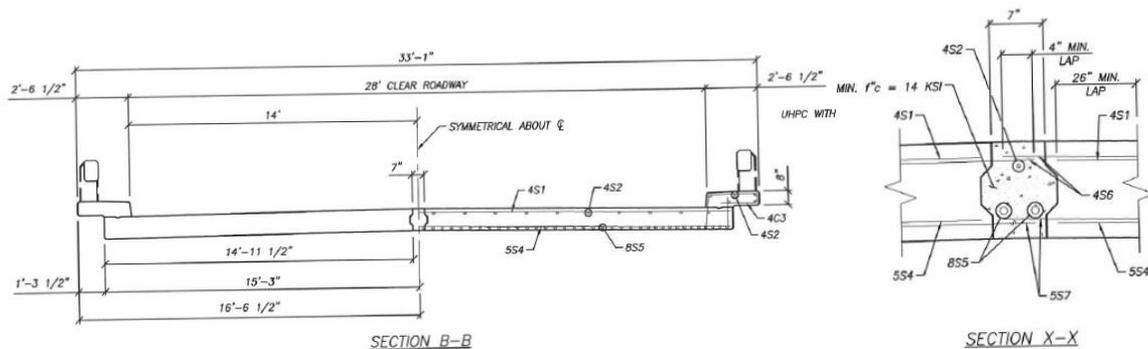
Precast slab bridge with UHPC longitudinal joint for US-441 over Taylor Creek.
